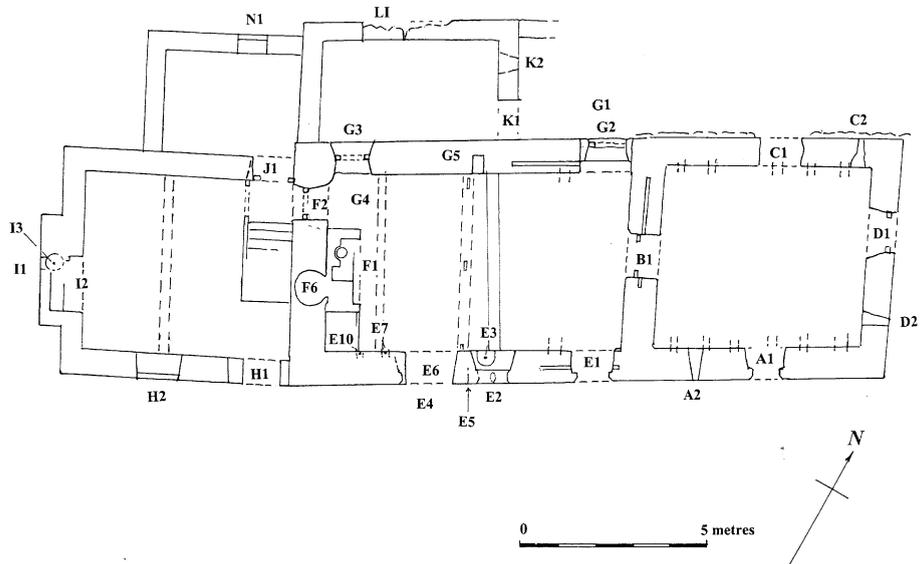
Steel, 'The Tenement' Ground Floor Plan (1:200). P. F. Ryder, 1994/9. For key see text.
